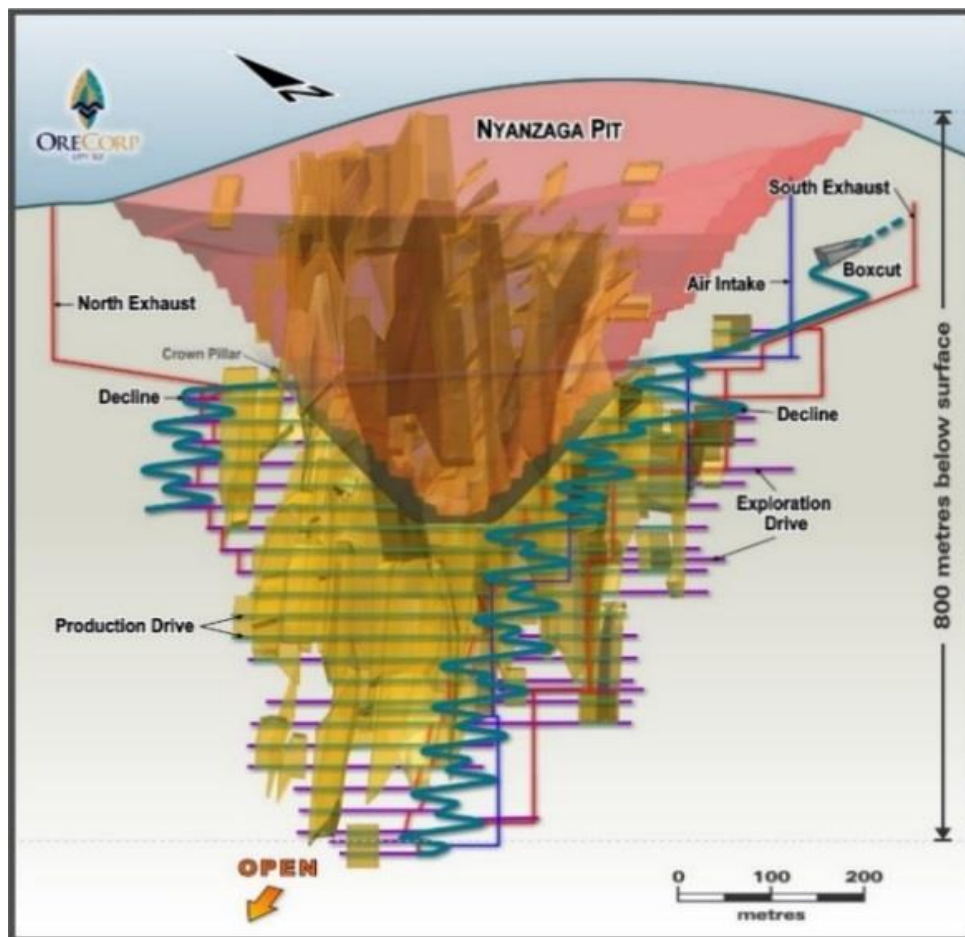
Nyanzaga Proposed Open Pit and Underground Mining Infrastructure (Looking Northeast)
